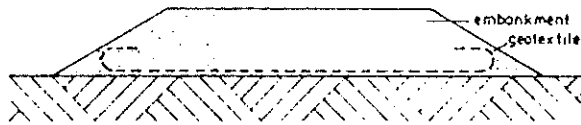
A geotextile sheet used as reinforcement in an embankment.
